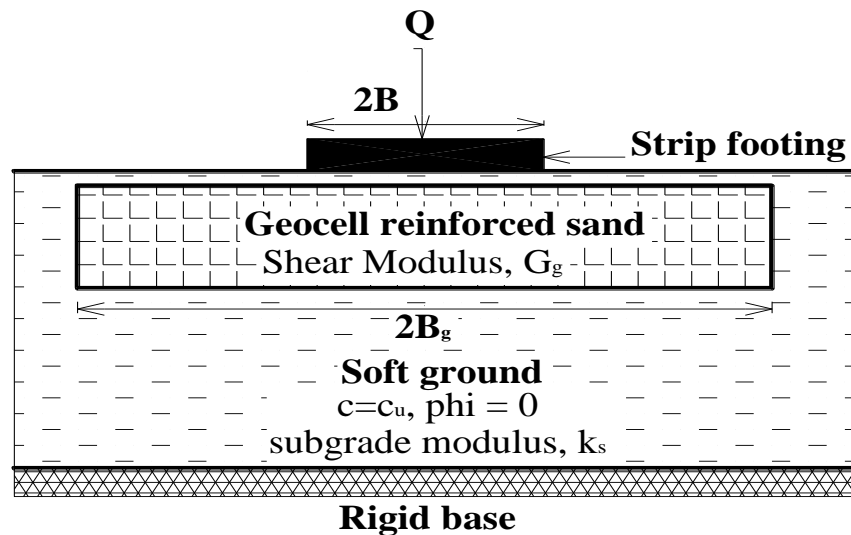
Definition sketch of strip footing on geocell reinforced foundation bed
